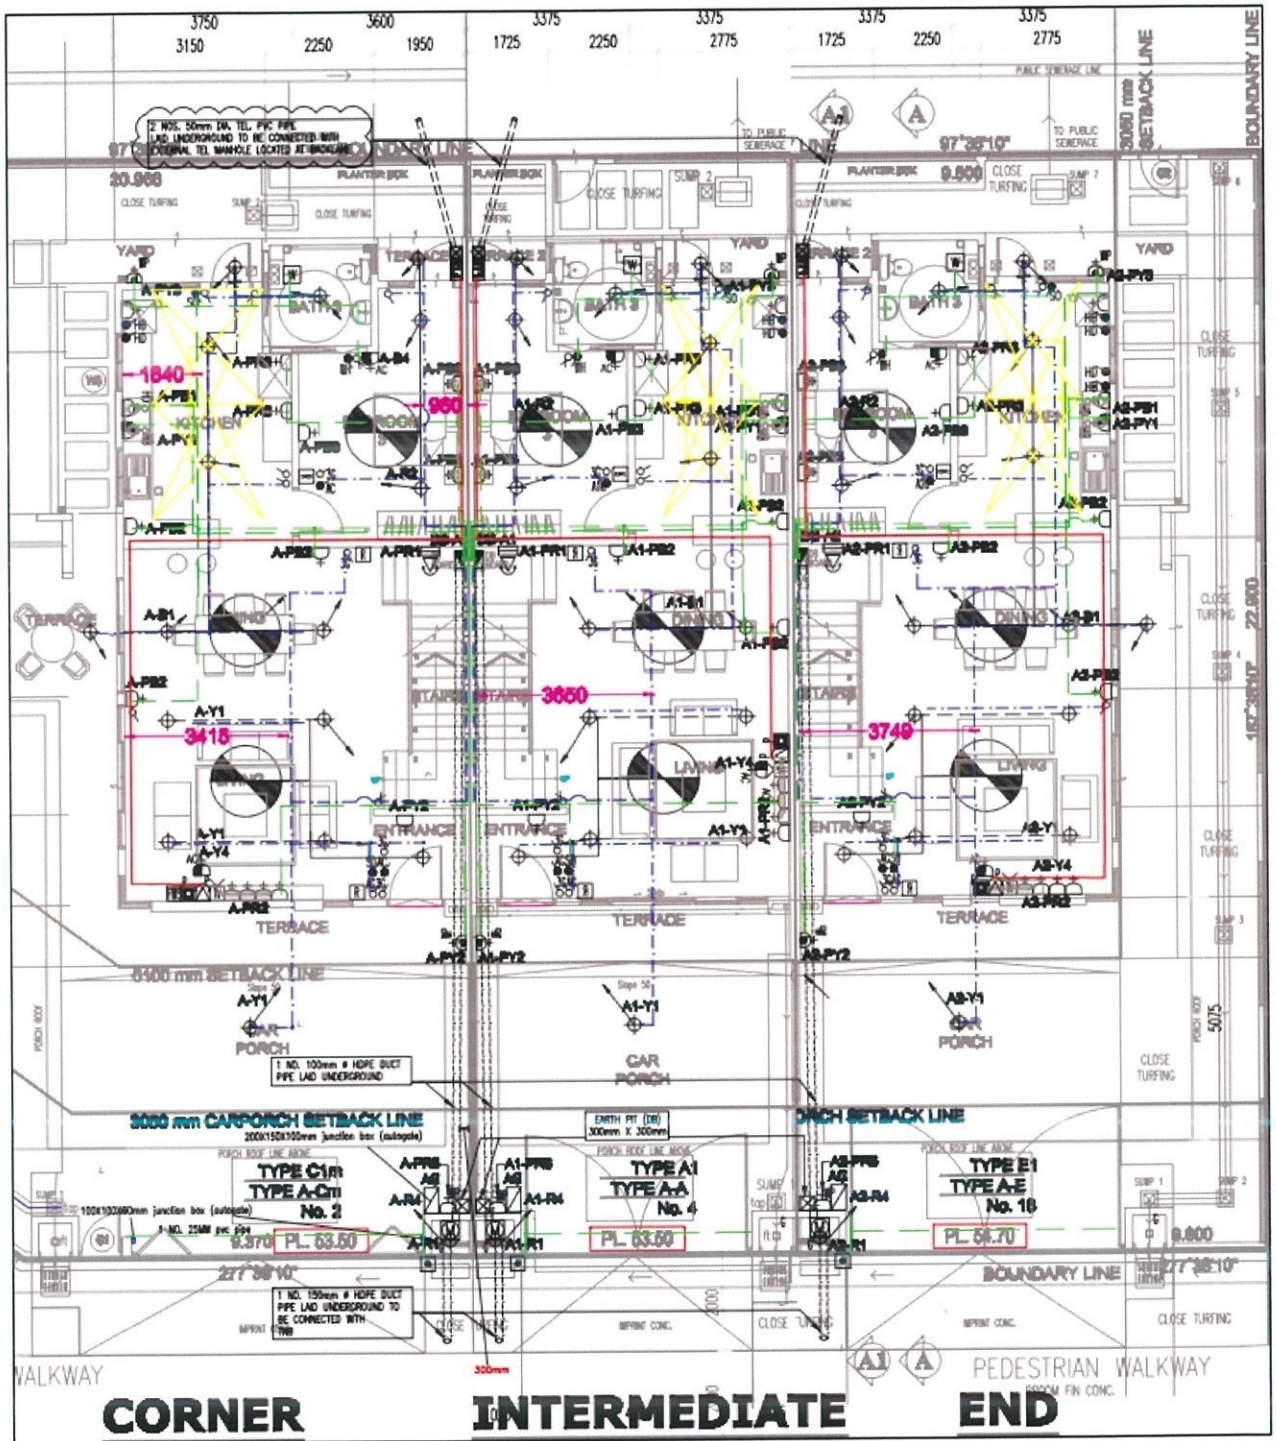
Electrical Services – Telephone pipe and Corrugated Electrical Pipe
